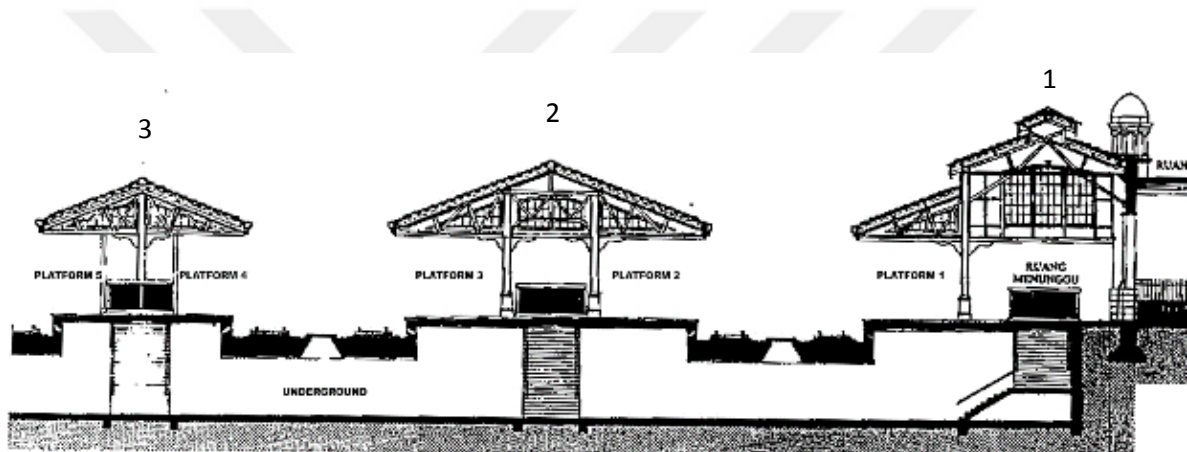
Turnham Green stations' train-sheds with steel column and timber panels as coverings
